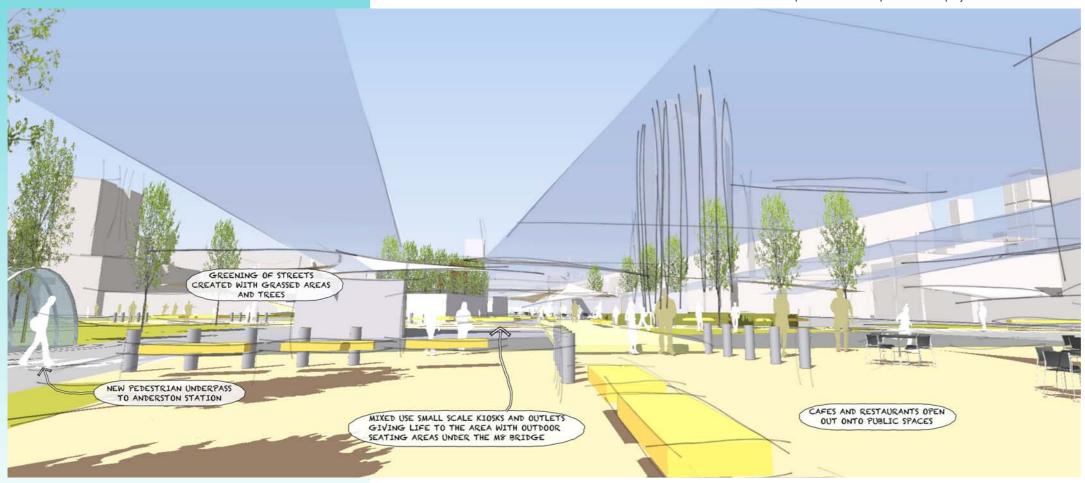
Sketch view looking north from Anderston station. Cafes and kiosks spill out onto new public spaces under the M8. (Hypostyle Architects 2014)
